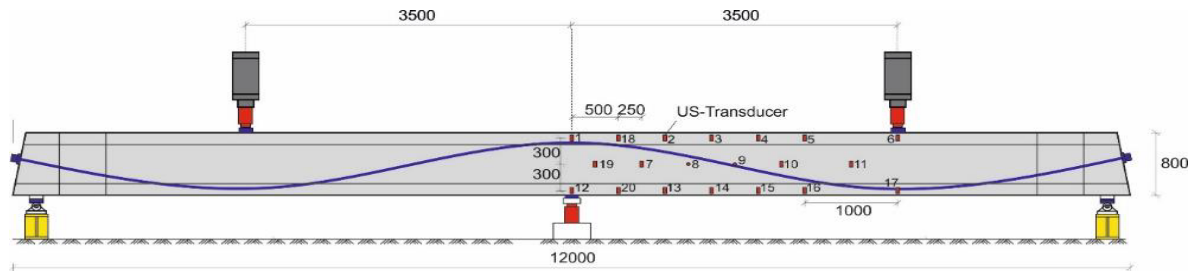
Sketch of load test setup for girder DLT 1.3 (dimensions in mm). Blue line: Tendon duct. Source: [18].
